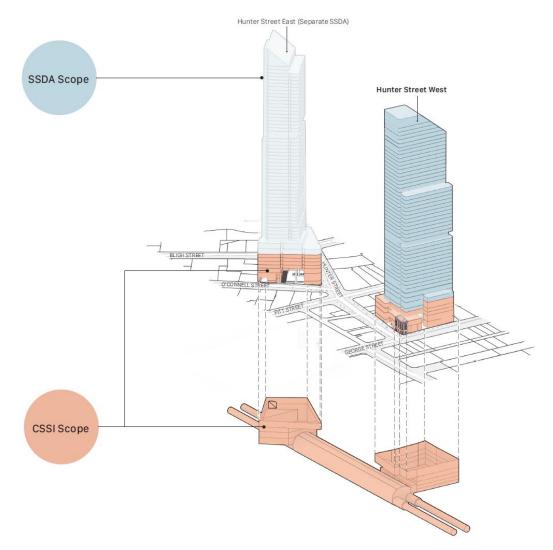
Proposed Concept SSDA development and CSSI scope
